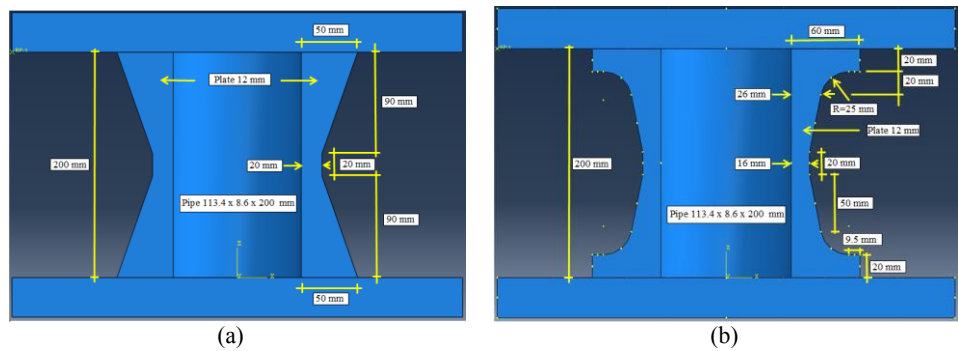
Details of the improved model of vertical steel pipe dampers: (a) Strengthened with a pair of trapezoidal shape plates and (b) Strengthened with a pair of curve shape plates
